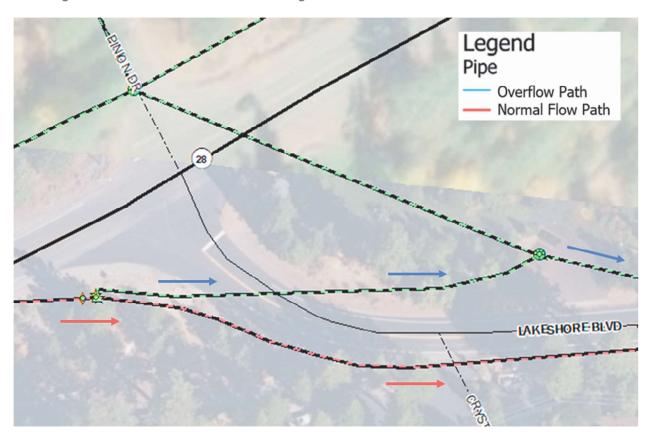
Lakeshore Boulevard & Highway 28 Sewer Overflow
